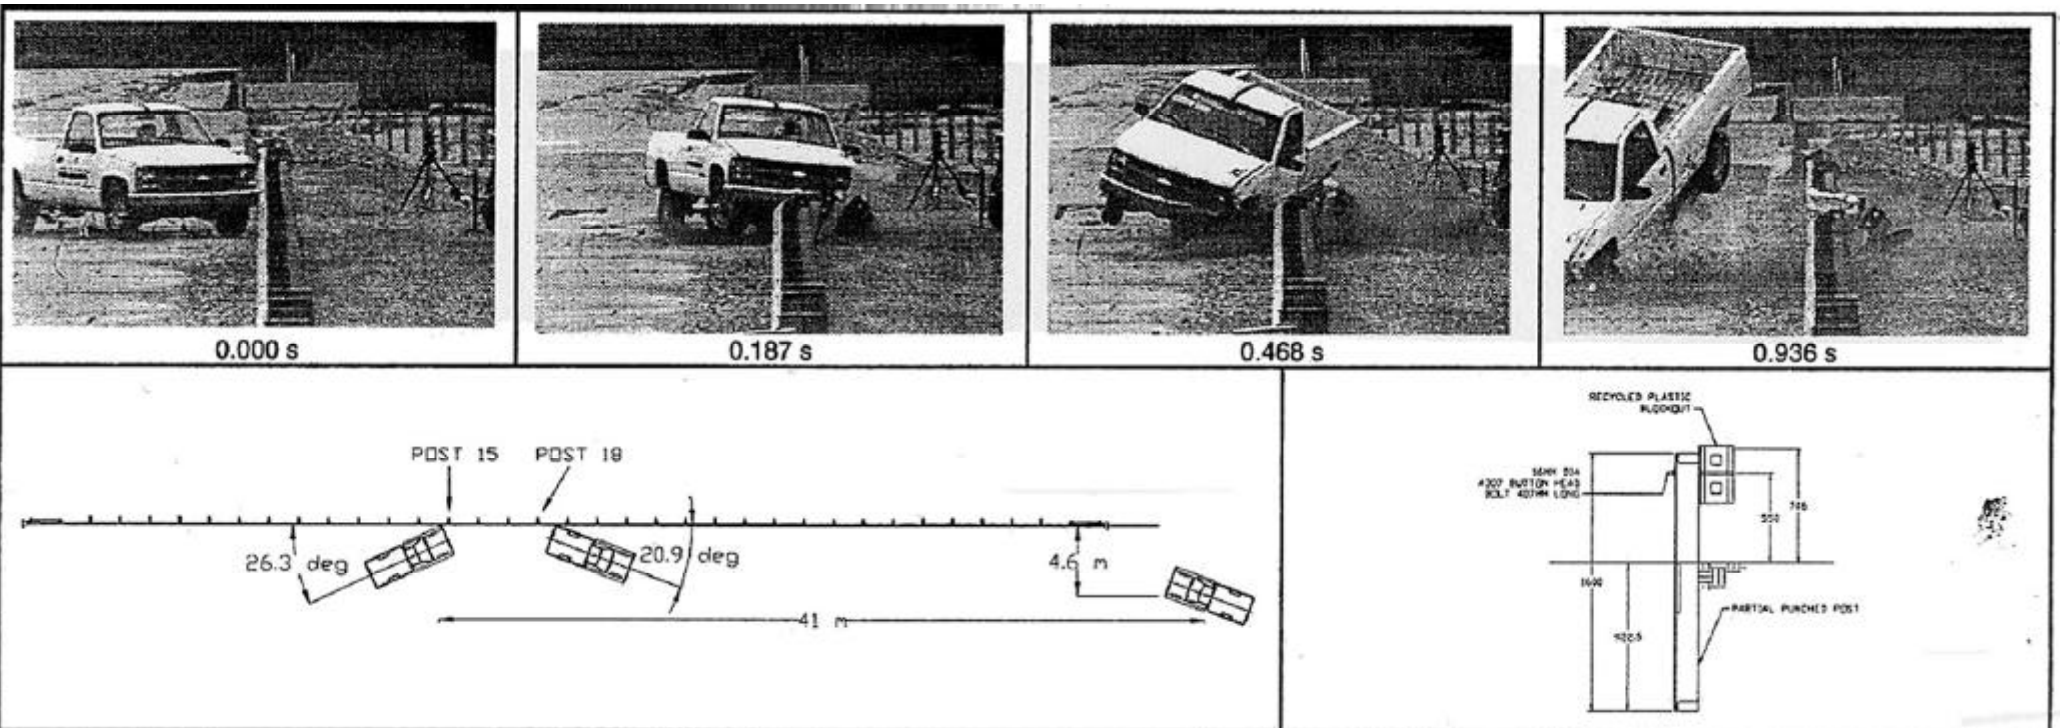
Details of guardrail installation with Central Fabricators, Inc. posts and blockouts.
